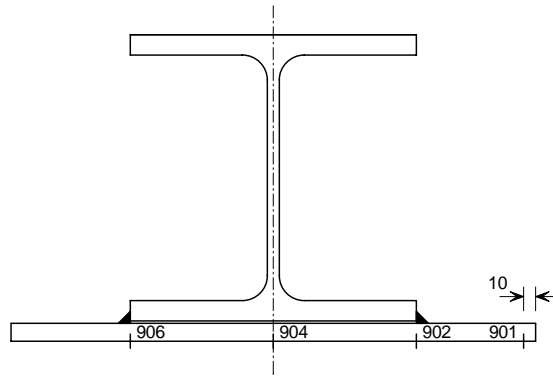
Edge beam transverse arrangement of thermocouples at position AB
